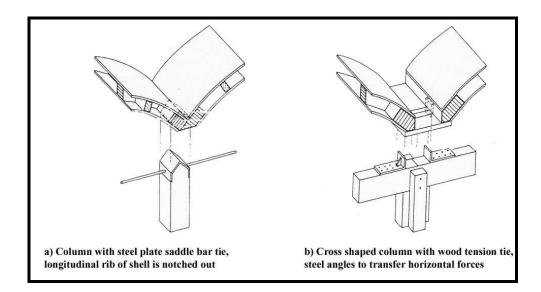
Column connection for hyperbolic paraboloid shells (Götz et al., 1989:167).
